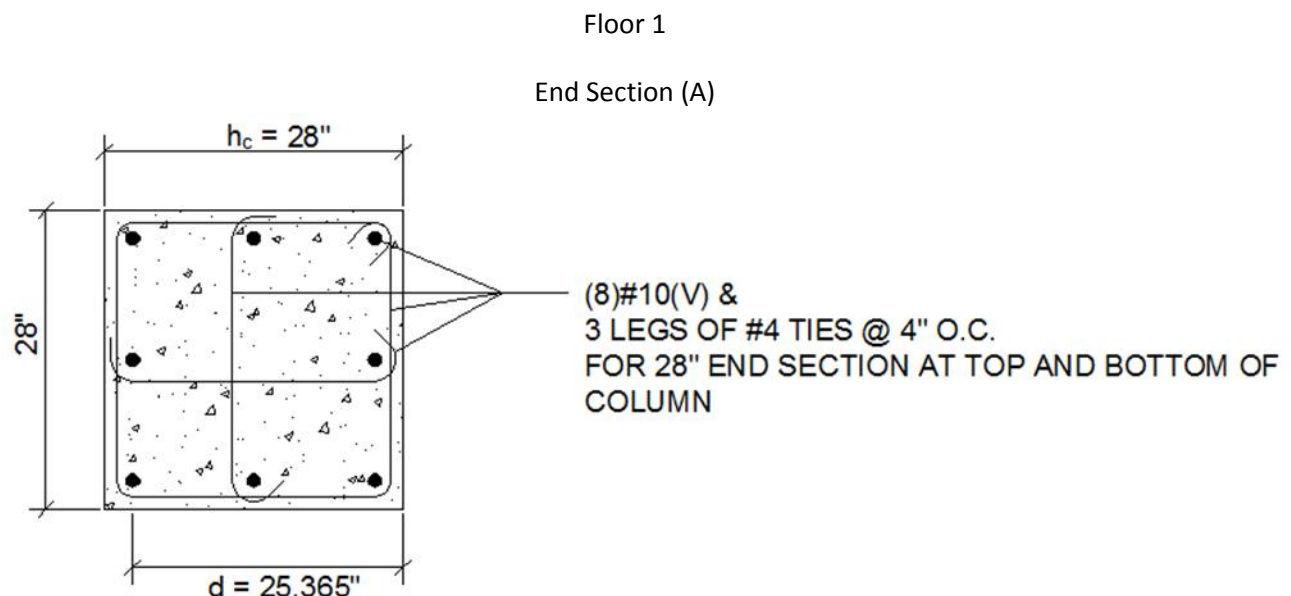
Exterior column, cross-section at end of column at ground floor level based on SDC D design.
